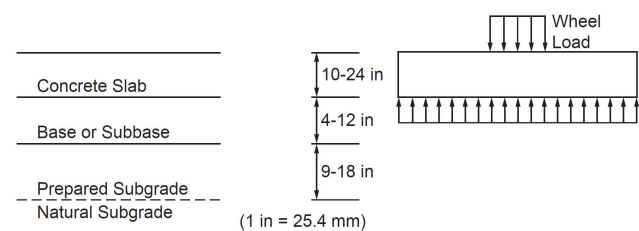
Cross section and stress distribution in a rigid pavement (from [1]).
